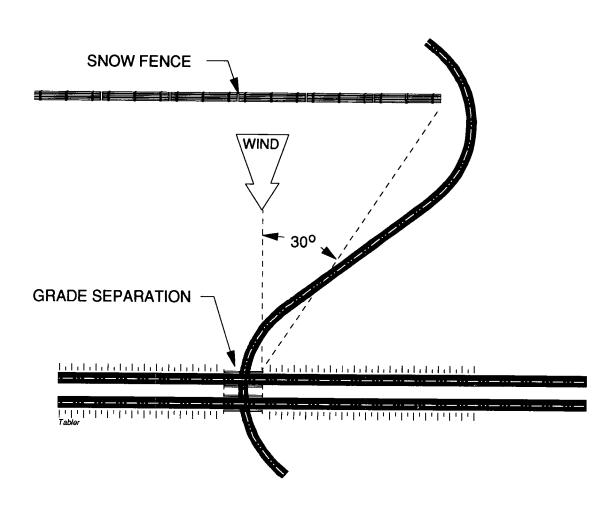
Roads passing under a grade separation should be designed to allow protective measures to be installed upwind.
